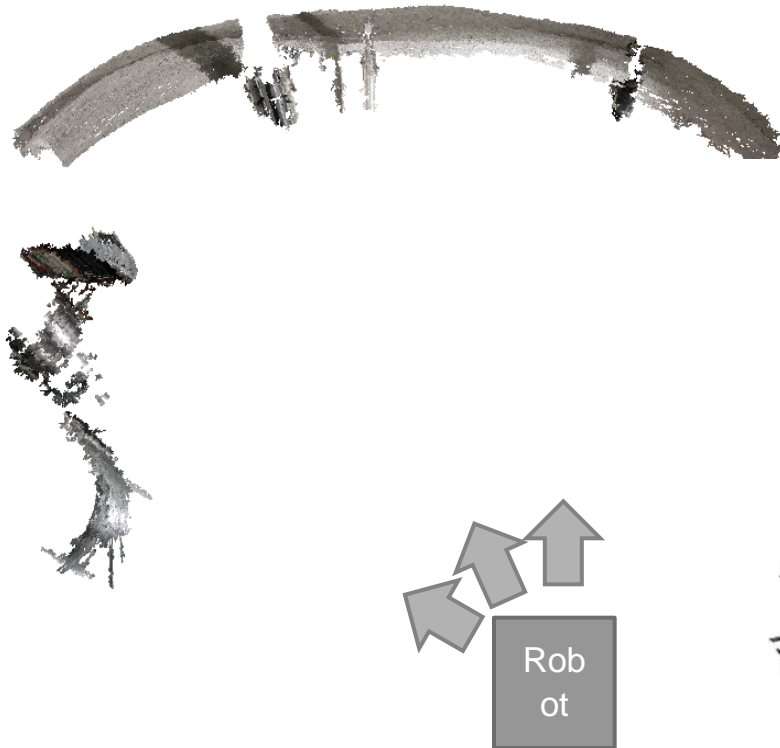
Side view of tunnel ceiling reconstructed from robot camera images
